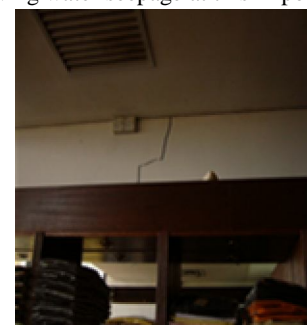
Crack appears at the beam possible due to building movement and requires immediate attention.
